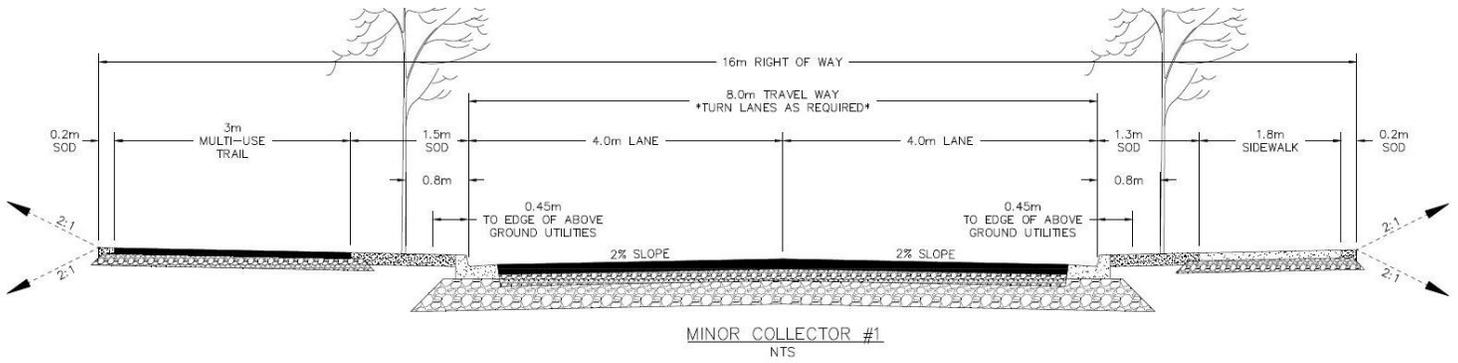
Proposed street cross sections for Minor Collector Roads 1. See Appendix B for larger image.
